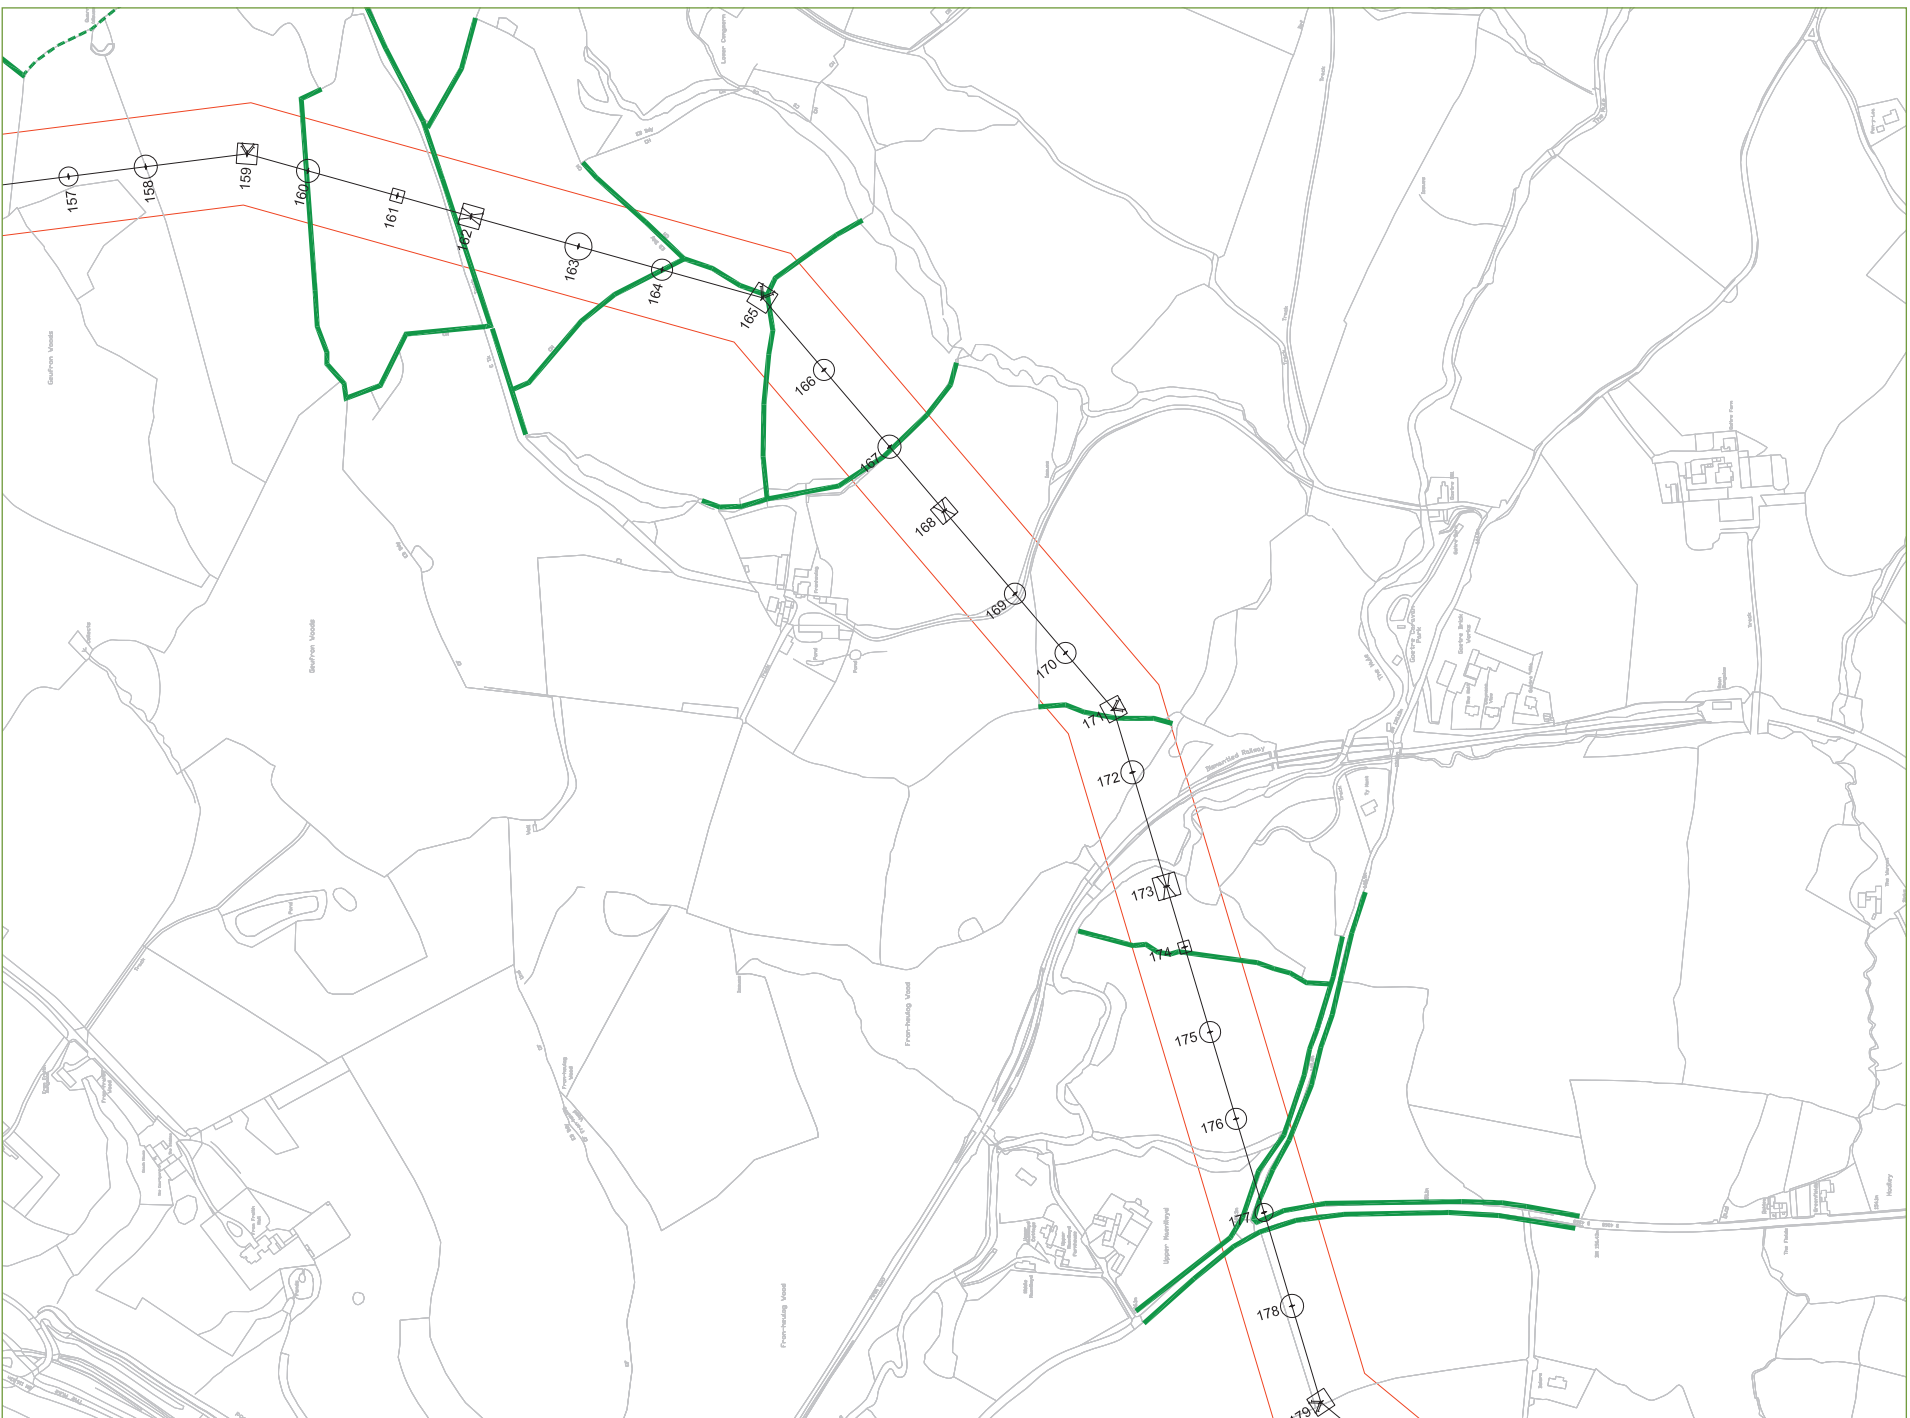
Hedgerow Plan Sheet 9 of 20
